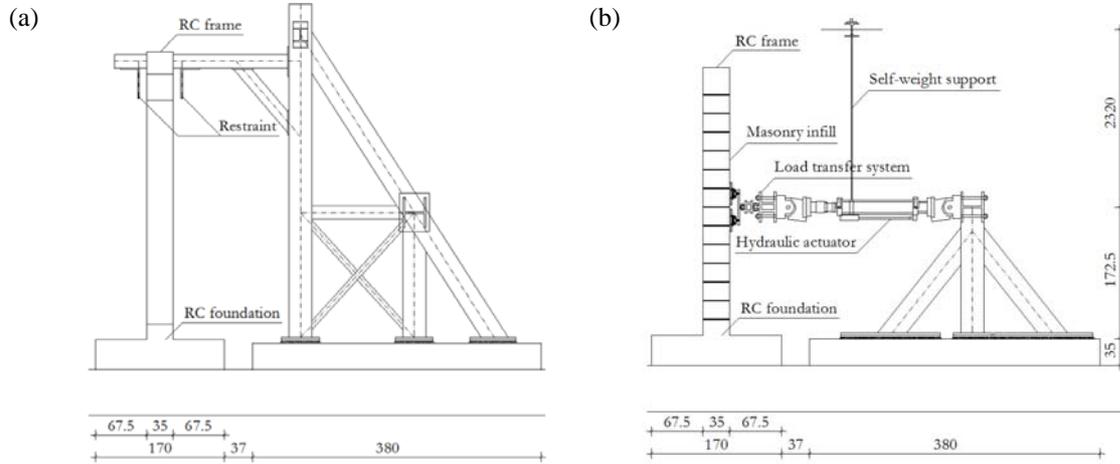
Layout of the out-of-plane test setup: (a) Restraining plane; (b) Reaction plane
